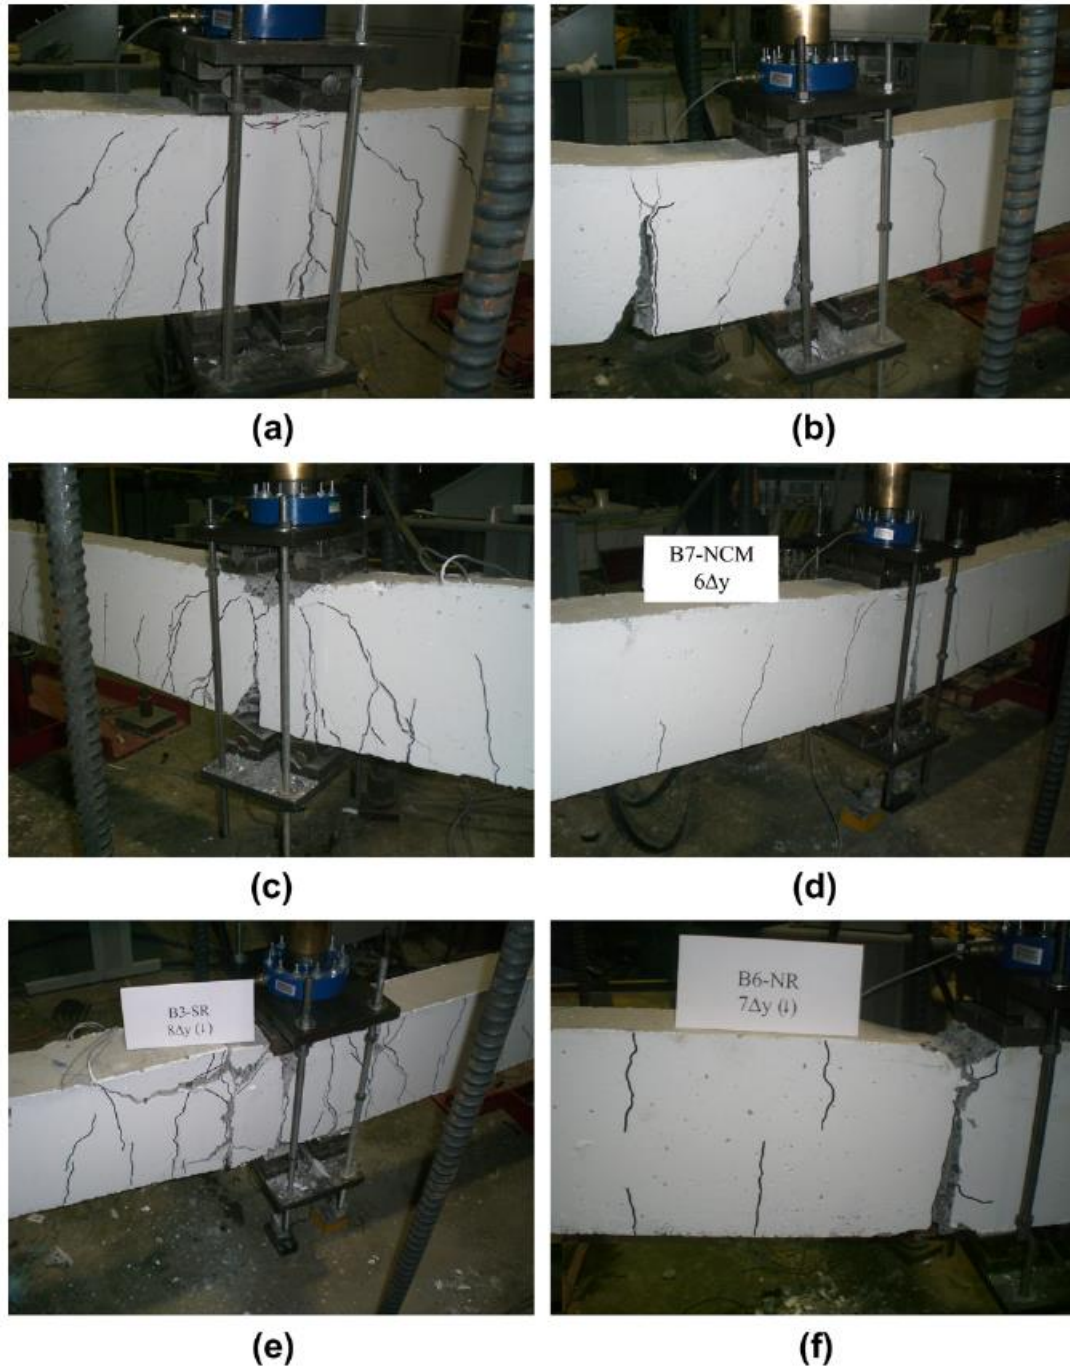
Crack pattern of test beams (Abdulridha et al., 2013)
